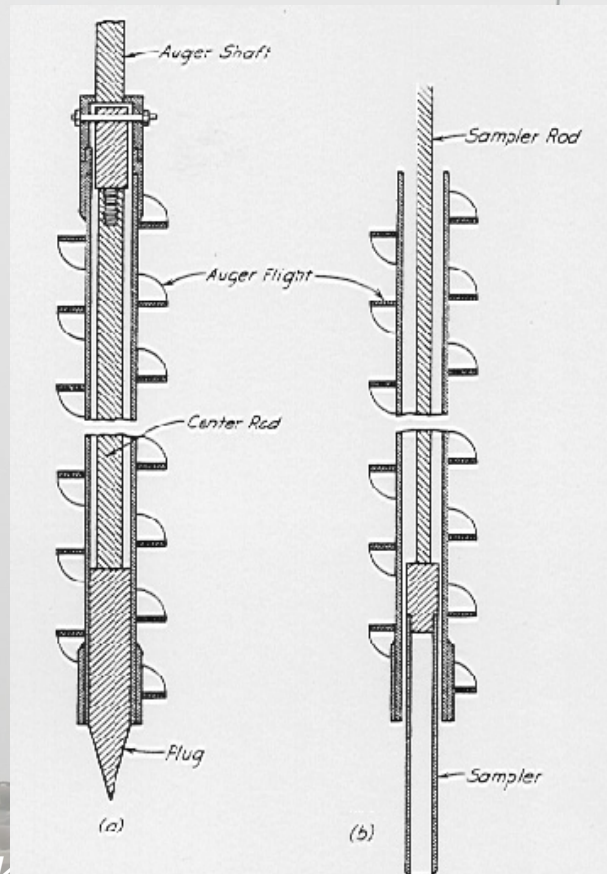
Hollow stem auger. (a) Pugged while advancing auger. (b) Plug removed and sampler inserted to sample soil below auger.
